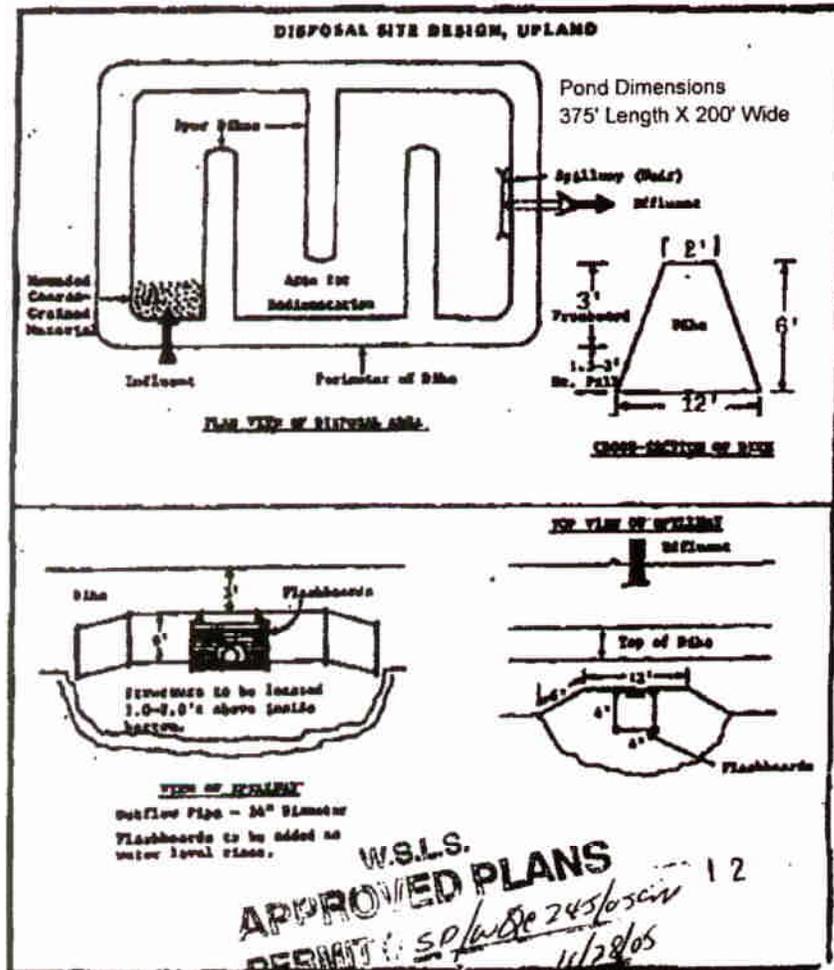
Plan view and cross-section of proposed dredge spoil containment area.
